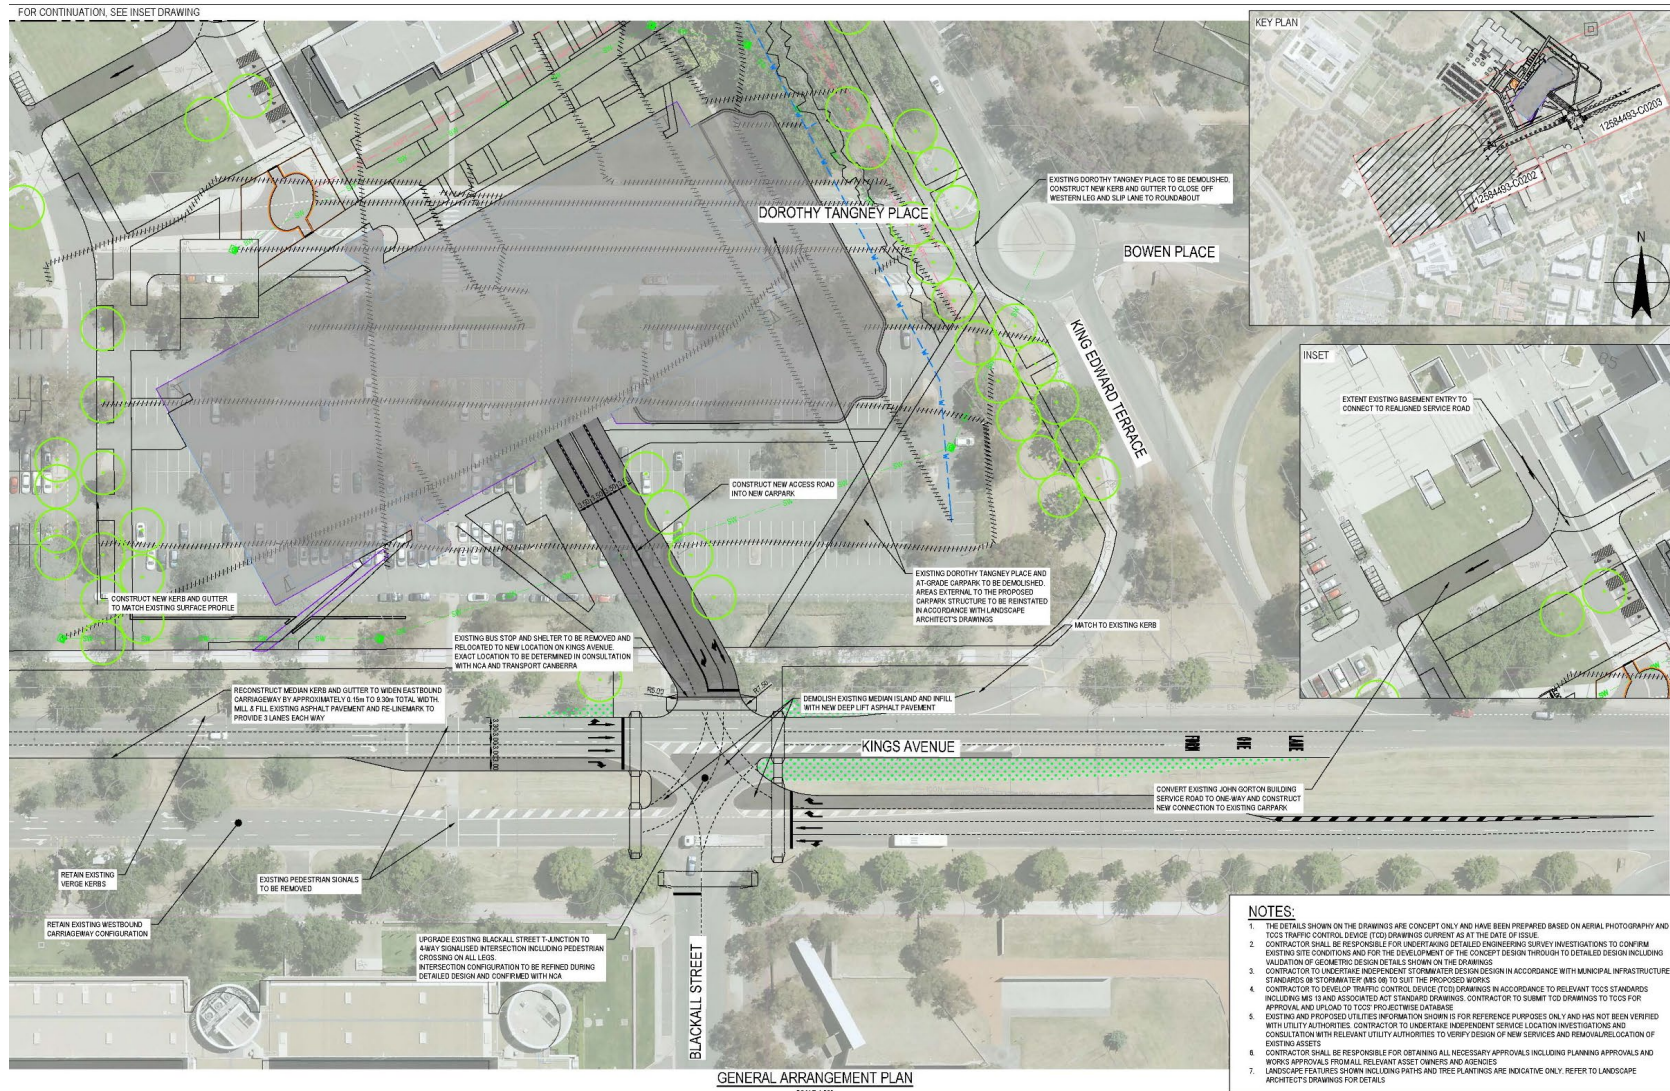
Proposed new intersection at Kings Avenue and Blackall Street. (Source: GHD, October 2022)
